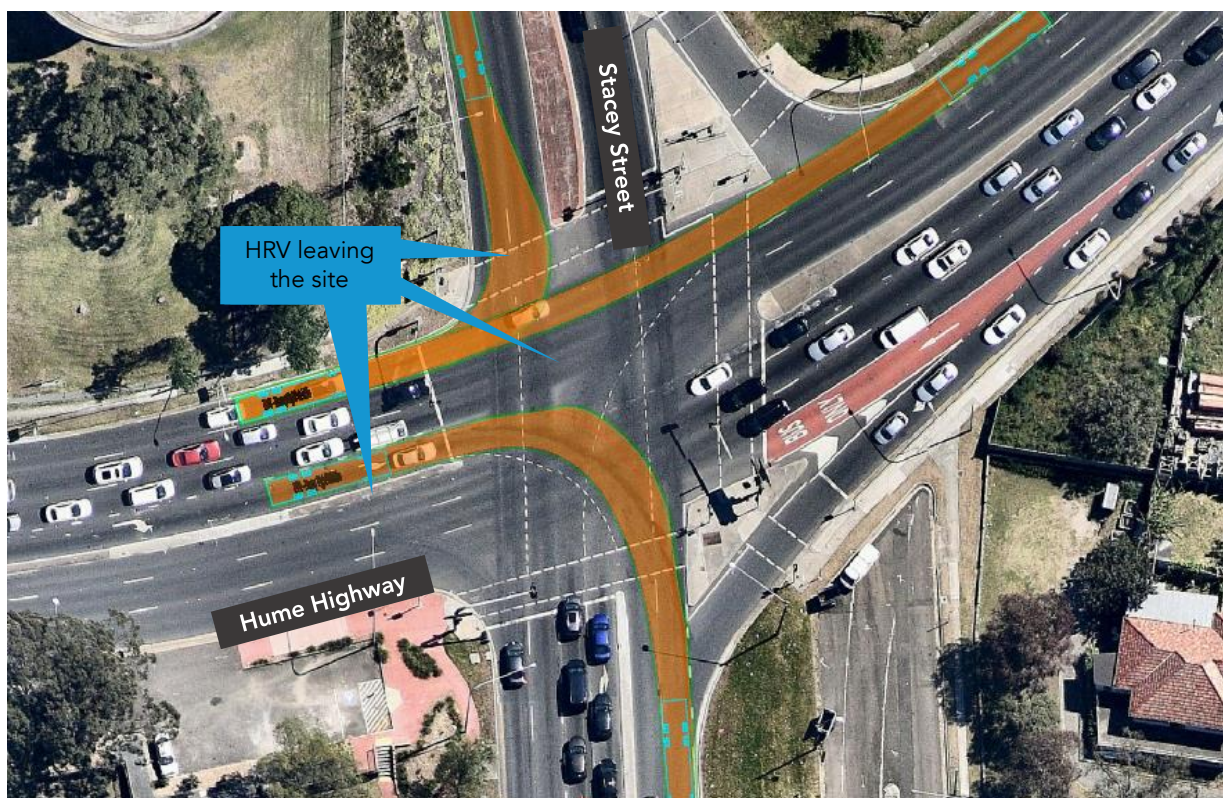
HRV leaving the site towards East via Hume Highway and North and South via Stacey Street
